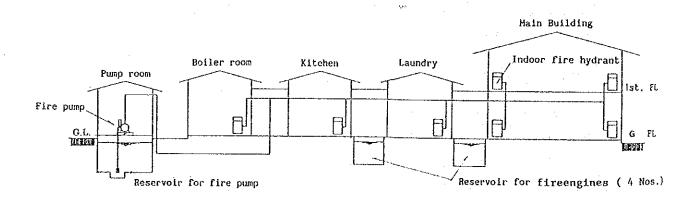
Schematic Piping Diagram of fire Extinguishing System
